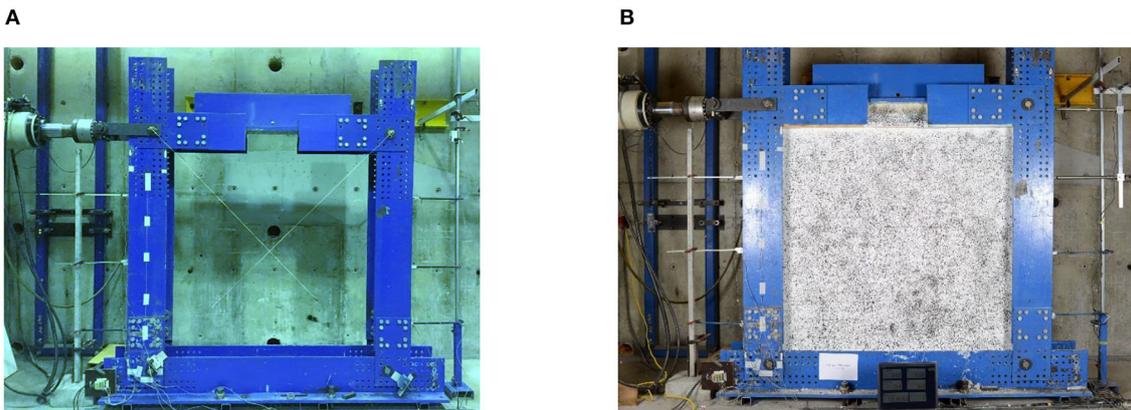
| Picture of the specimens. (A) Bare Frame. (B) General vision of the steel frame infilled with a semi-interlocking masonry (SIM) panel.
